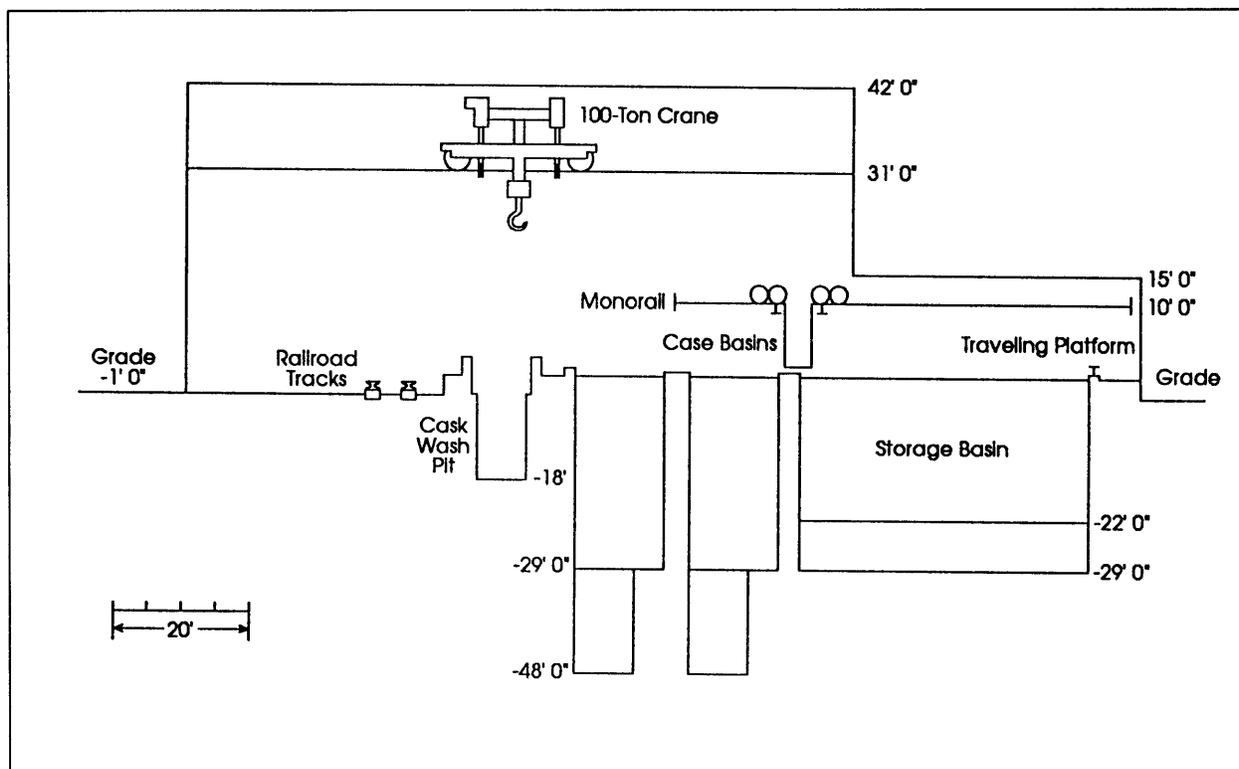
Elevation Schematic of the RBOF (Facing East)
